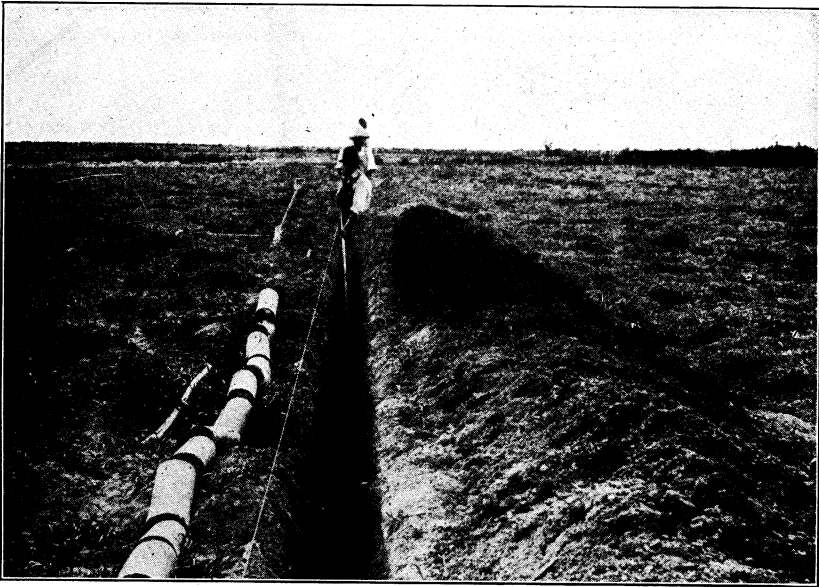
Laborers digging a ditch preparatory to laying tile at Columbia, S. C.
